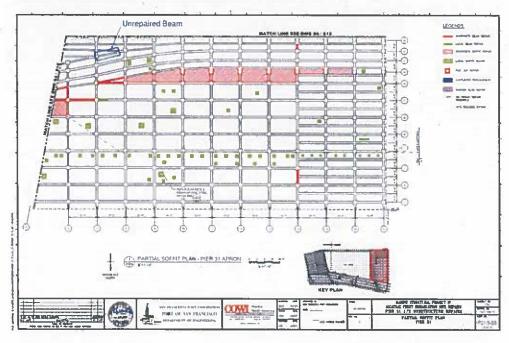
Location of Unrepaired Beam, Pier 31 Bent 7-8, Row B.
